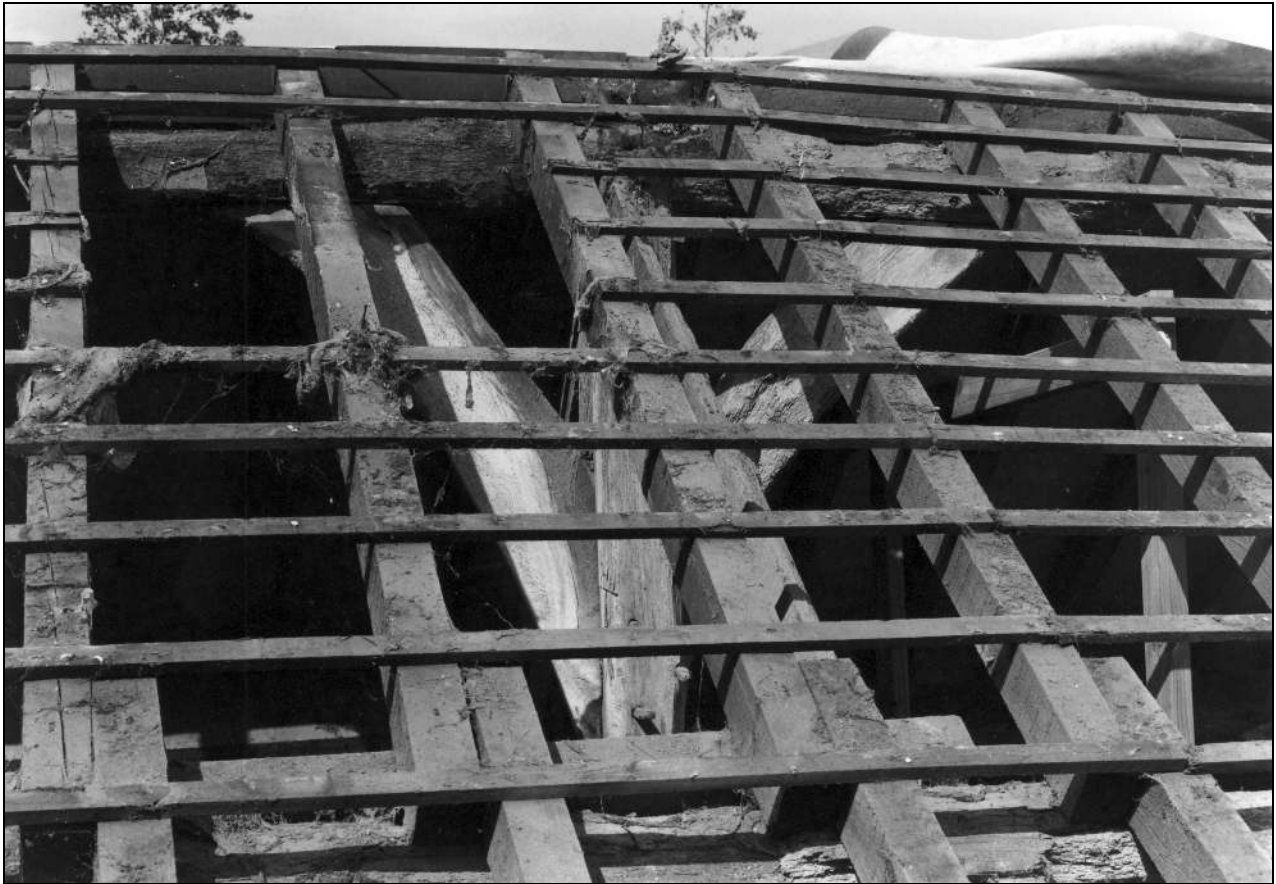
Ridge braces of south truss, from the east, during watching brief (film 5, frame 18)
